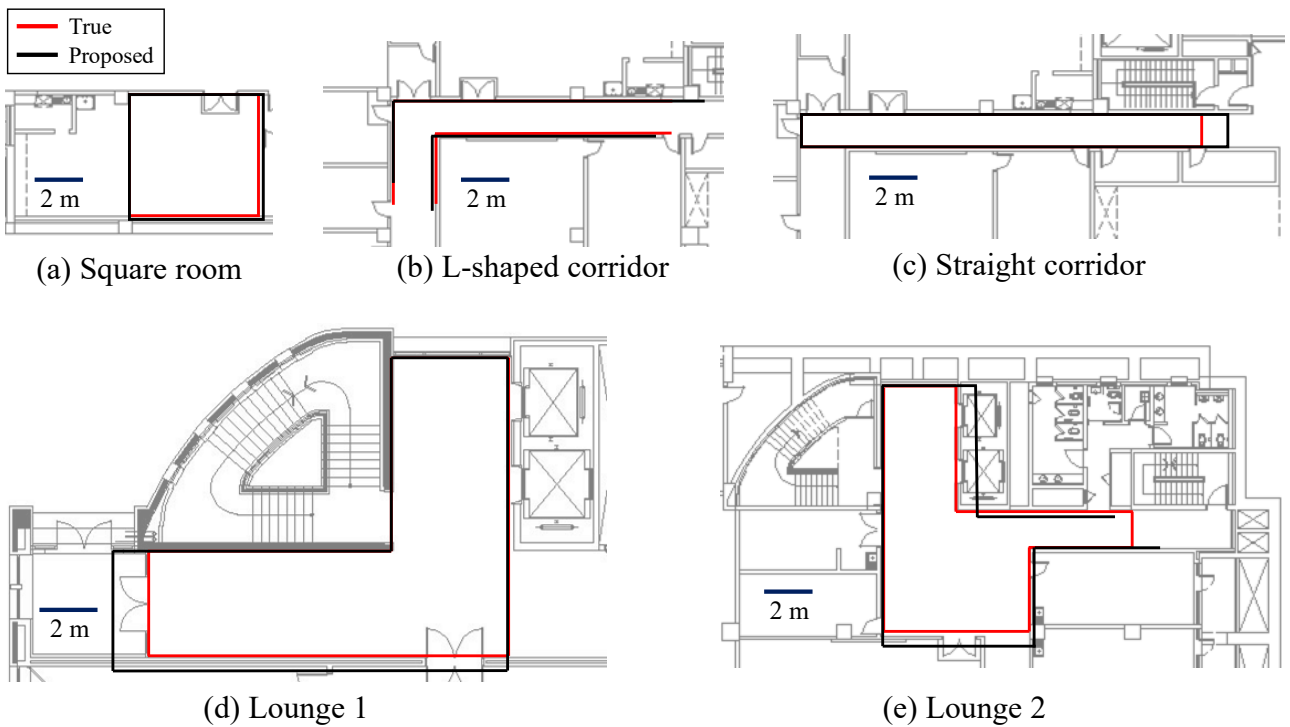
Ground truth floor plan (red line) and the floor plan of the proposed method (black line). We overlap the floor plan of the proposed method with the floor plan of the buildings to check the accuracy of the proposed method.
